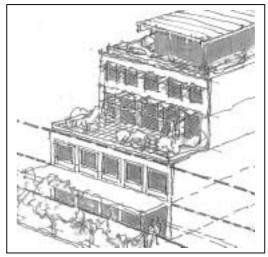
Acceptable. Taller components of buildings may be stepped back, with the podium level continuing the building frontages.
